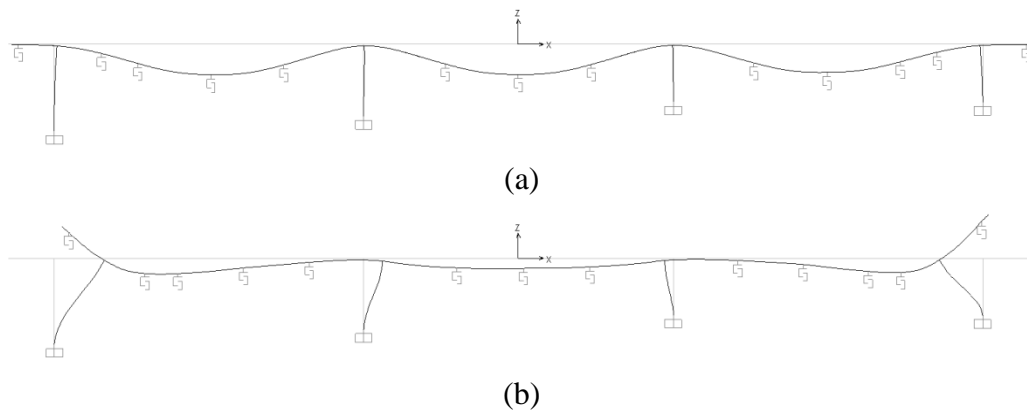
Deformed shapes of Frame 2, Bridge 1 (SAP2000): (a) Before stressing; (b) Immediately after stressing
